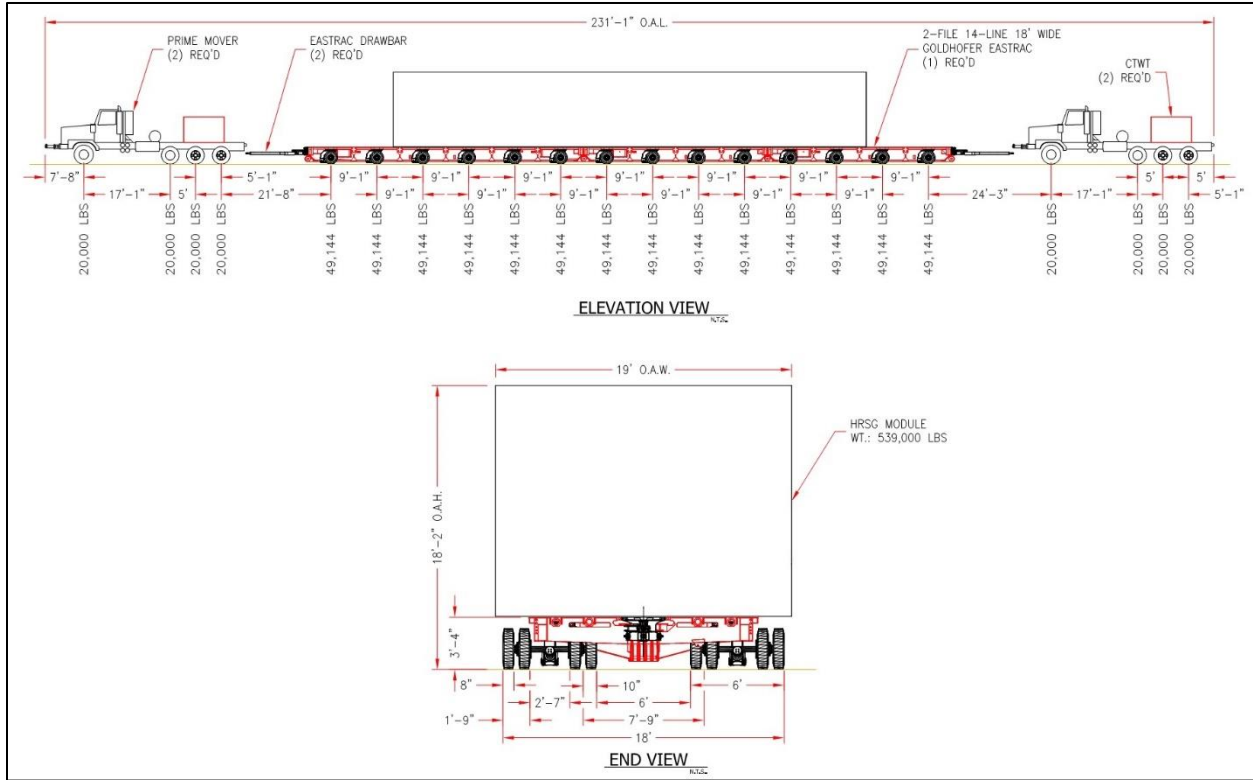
Axle and weight configuration of heaviest proposed permit load.
